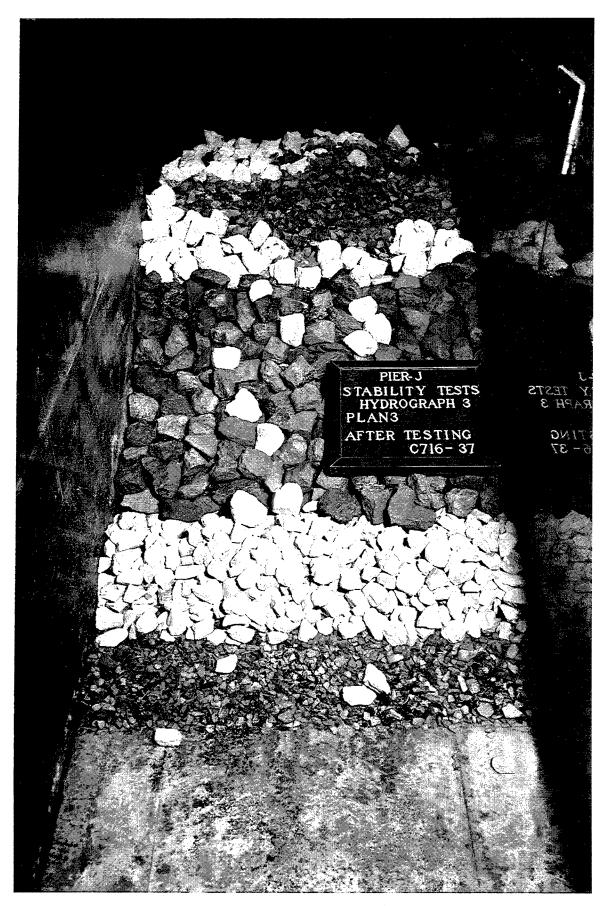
Sea-side view of Plan 3 at the conclusion of testing
